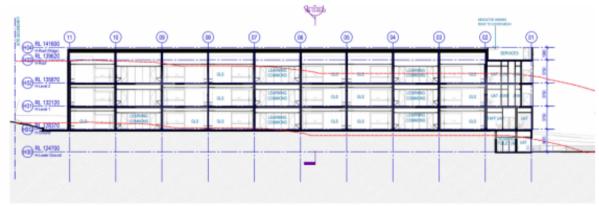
Building height plan diagram – north-south axis section of new classroom building
